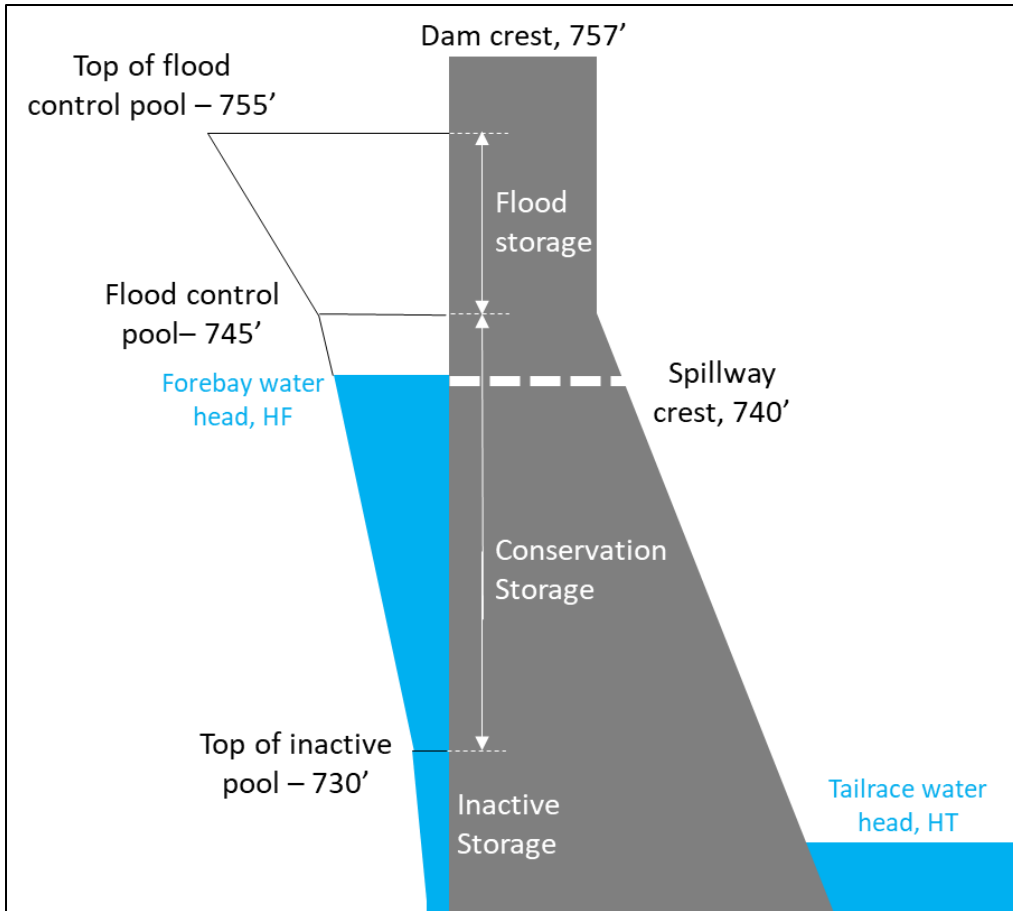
Cross-section of Pensacola dam (not to scale) showing relevant elevations (from mean sea level, MSL)
